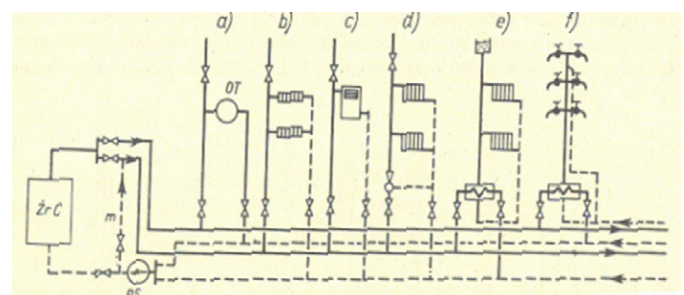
Four-pipeline network: a) direct connection of technological receivers, b) direct connection of central heating, c) direct connection of ventilation heaters, d) direct connection of central heating via hydro-elevator, e) indirect connection of central heating, f) indirect connection of hot tap water installation [12].]
